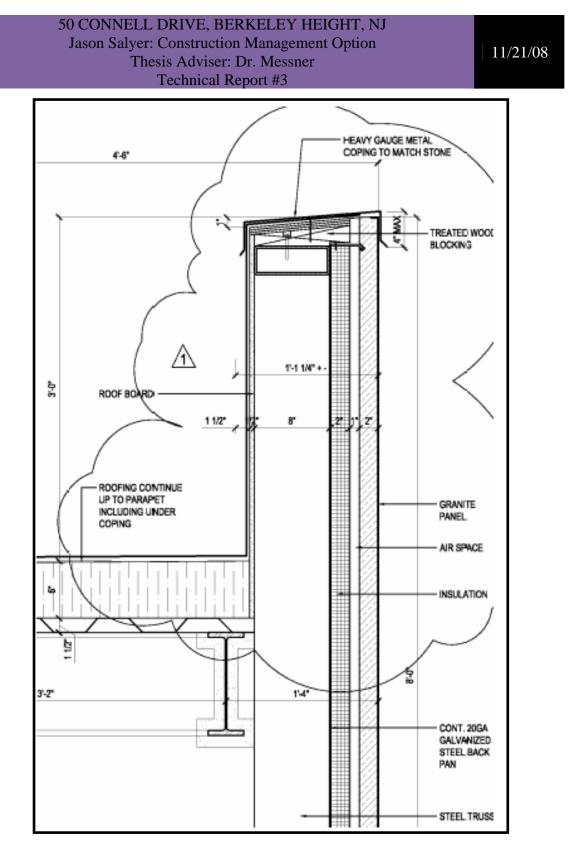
Parapet Detail Showing Rubber Roofing Under Coping
